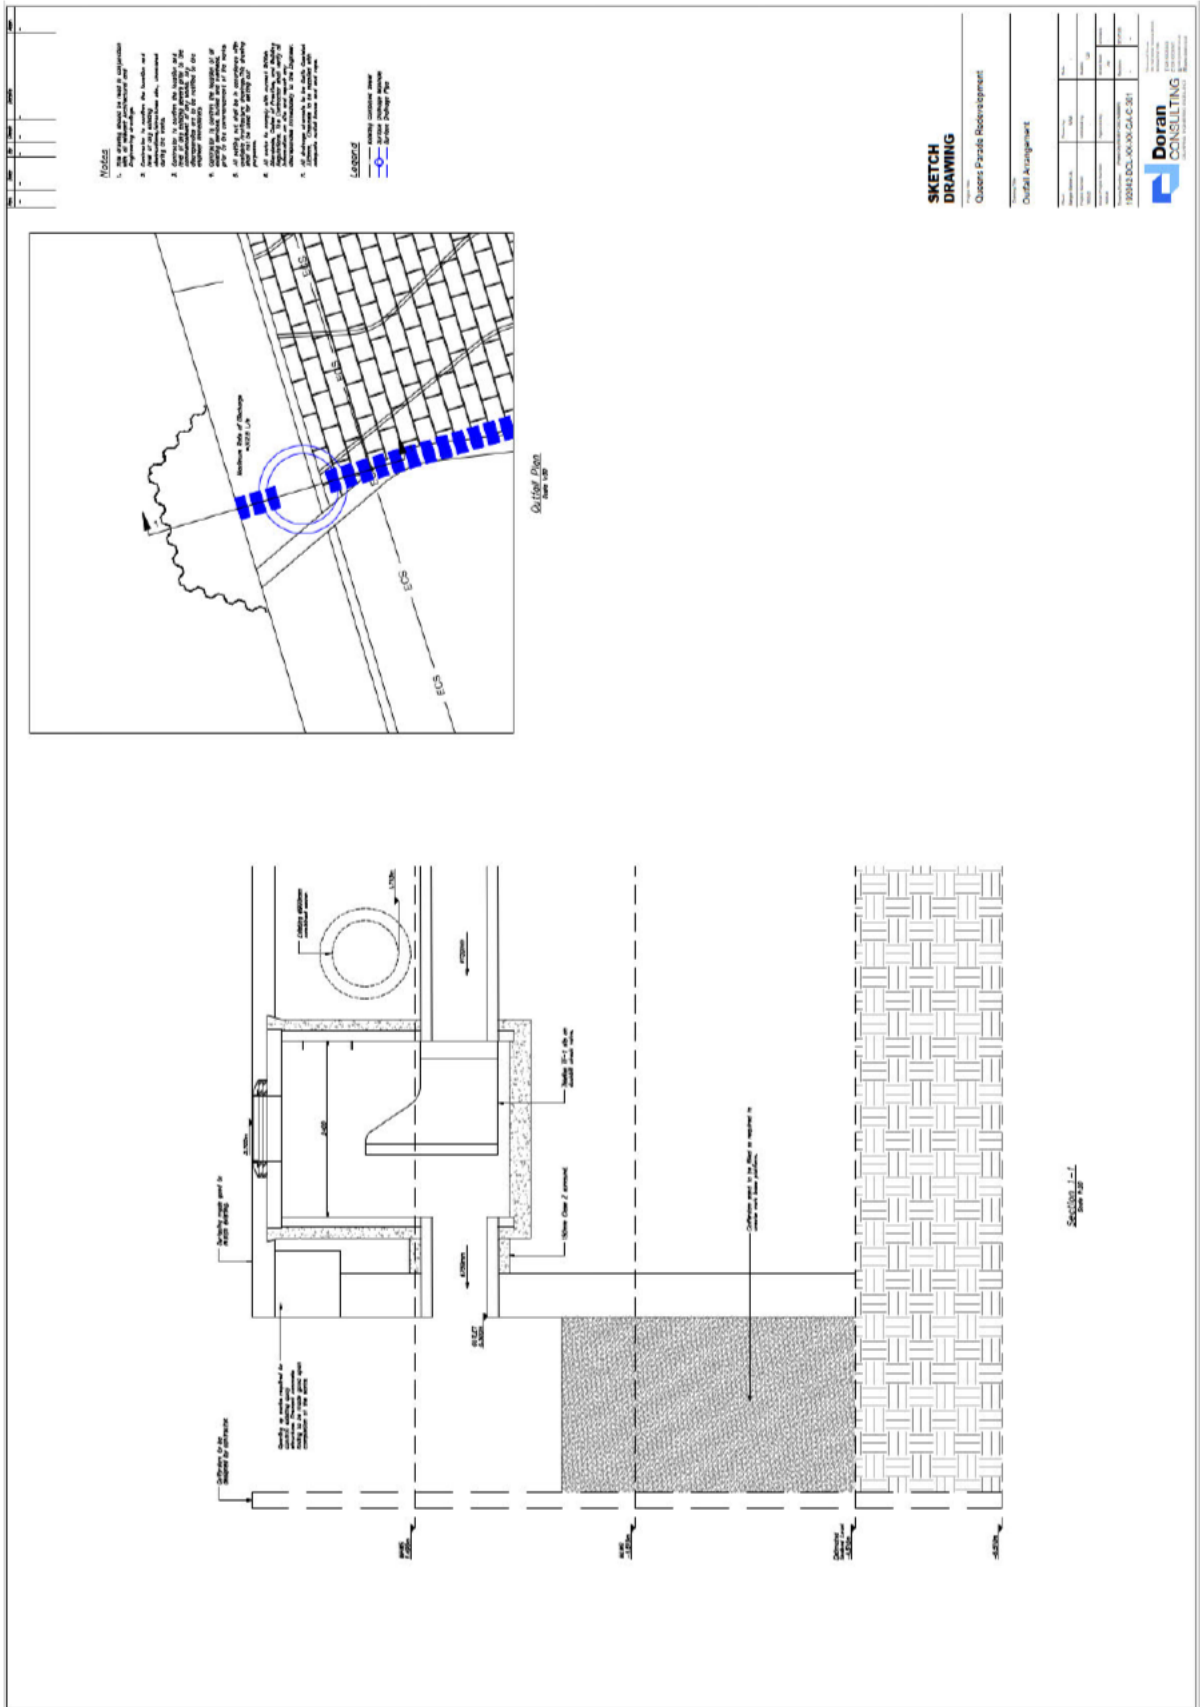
Drainage Layout (Detailed Version with Clear Notes in Section 6.0)
